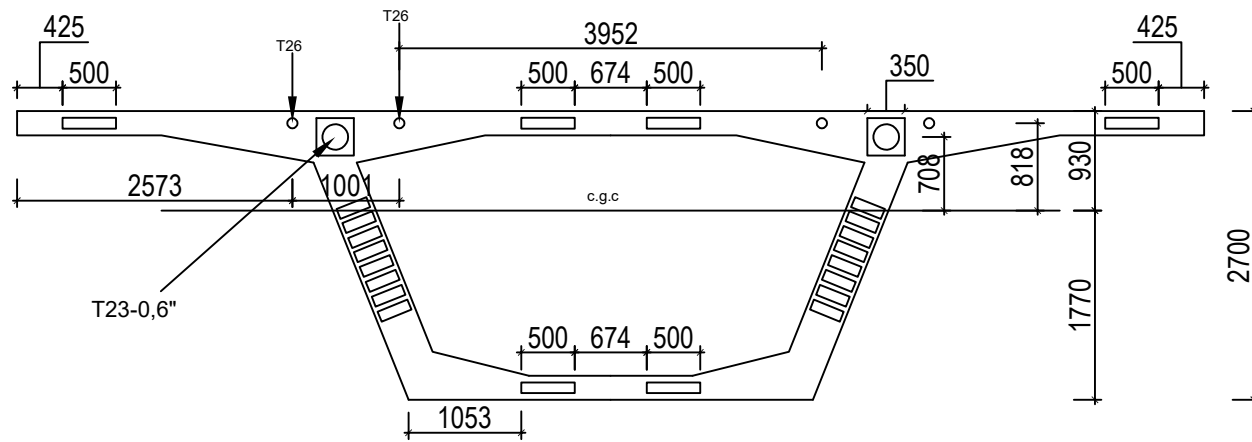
DETAIL BOX GIRDER SEGMENT 5 & 5L (S5 & S5L)
